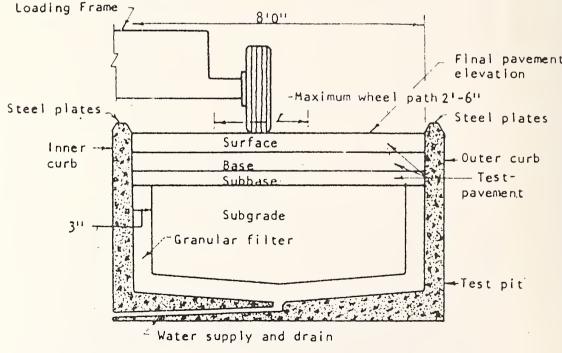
Schematic Diagram of the University of Illinois Pavement Test Track.
